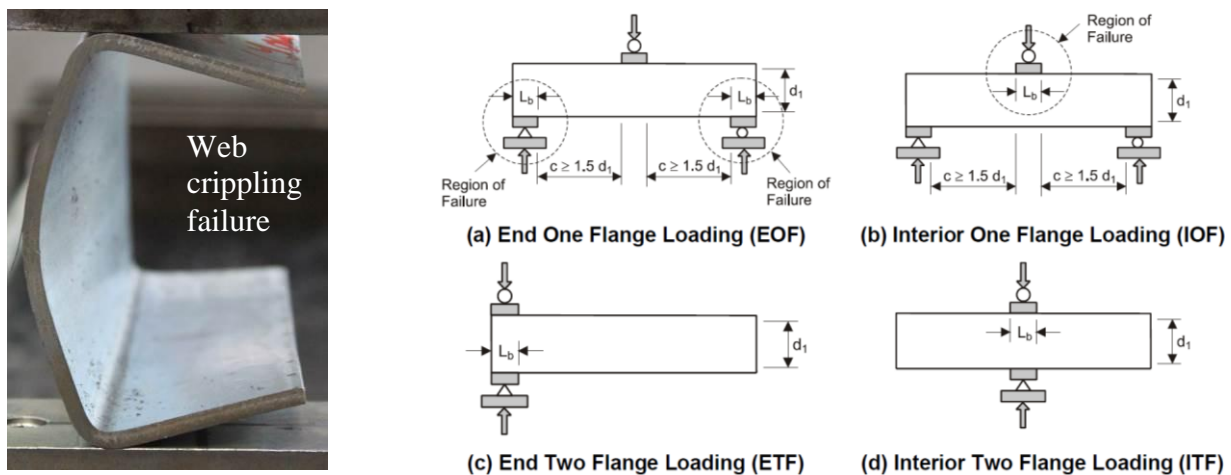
Web crippling failure and loading conditions for bearing tests (AISI 2008).
